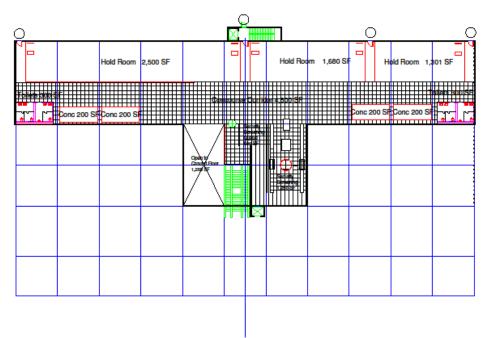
Terminal Building Schematic Plan: Second Floor
